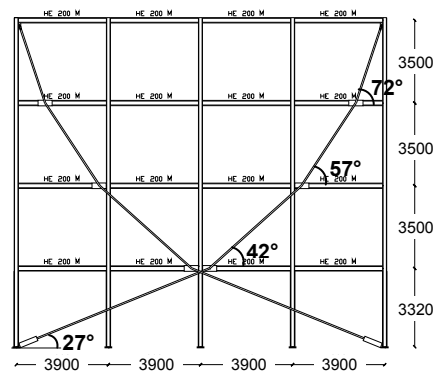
Cable Layout for CX1 and CX6 External Alignments in the Main Building
